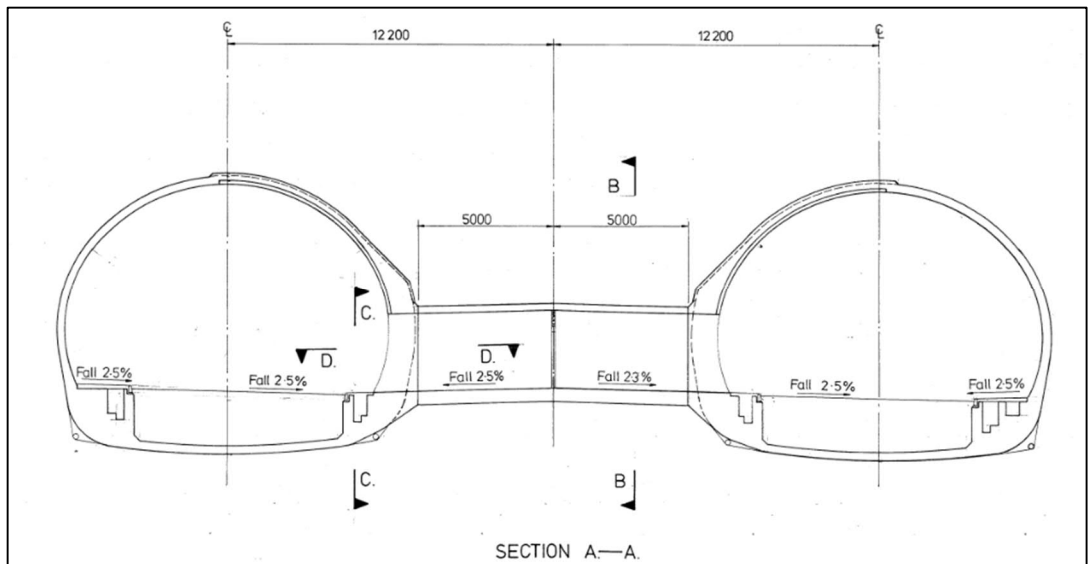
Indicative cross section for a typical twin bore highway tunnel (courtesy of Highways England – Southwick Tunnel).
